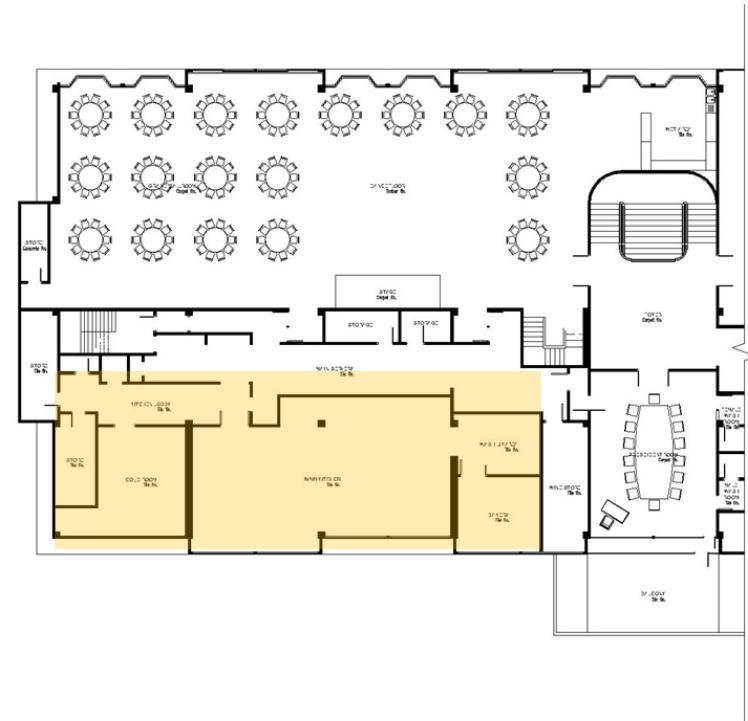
(al): Layout of highlighted ground floor plan (Lim,2017)
